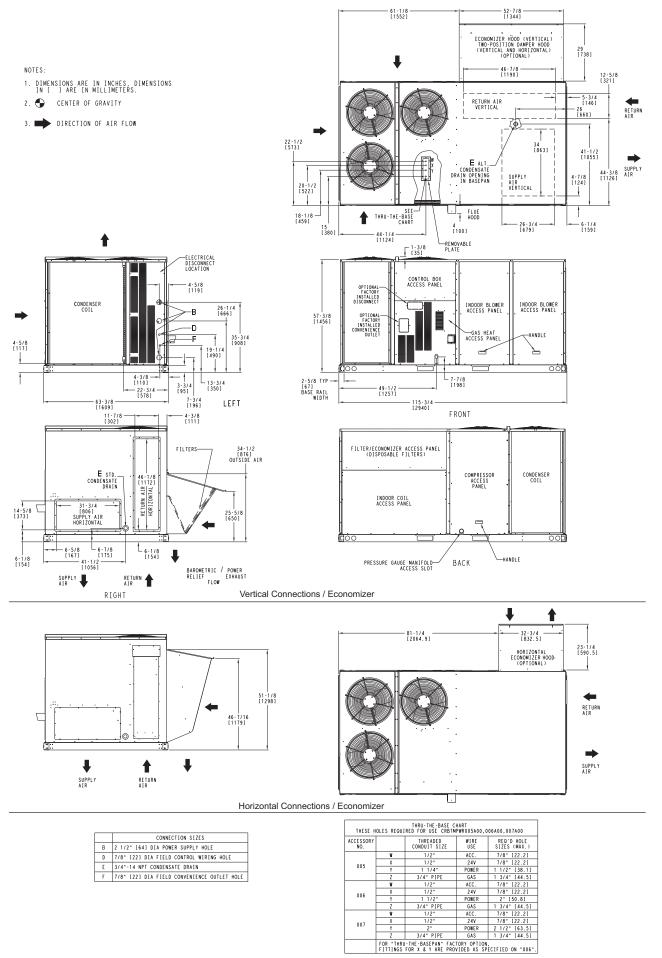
Unit Dimensional Drawing - 16 Size Unit
